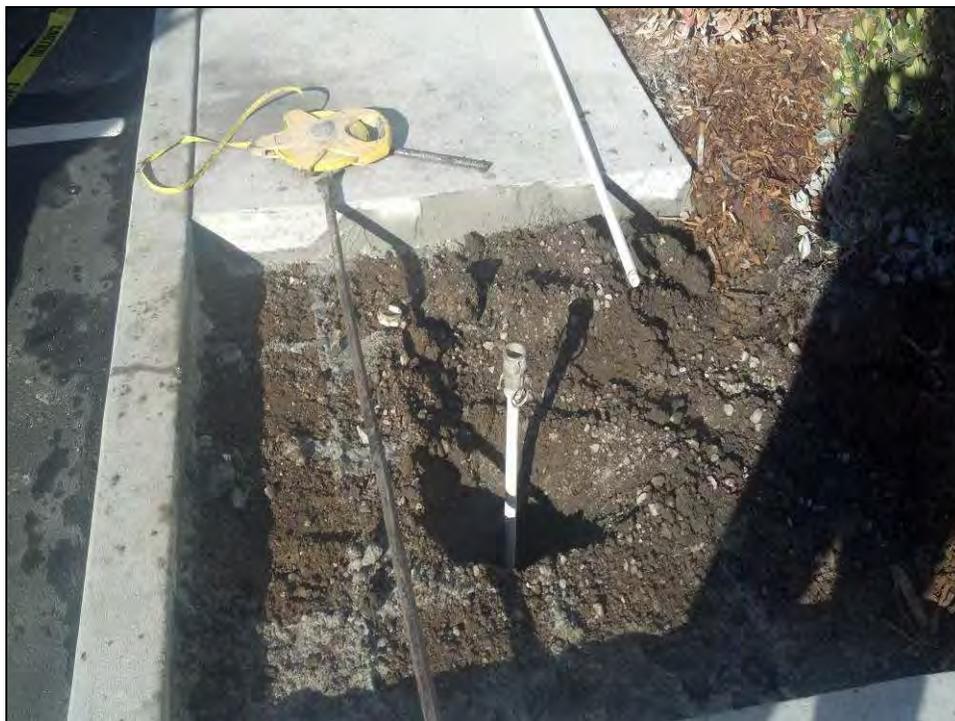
View of the new sidewalk flags at monitoring well location 33.
